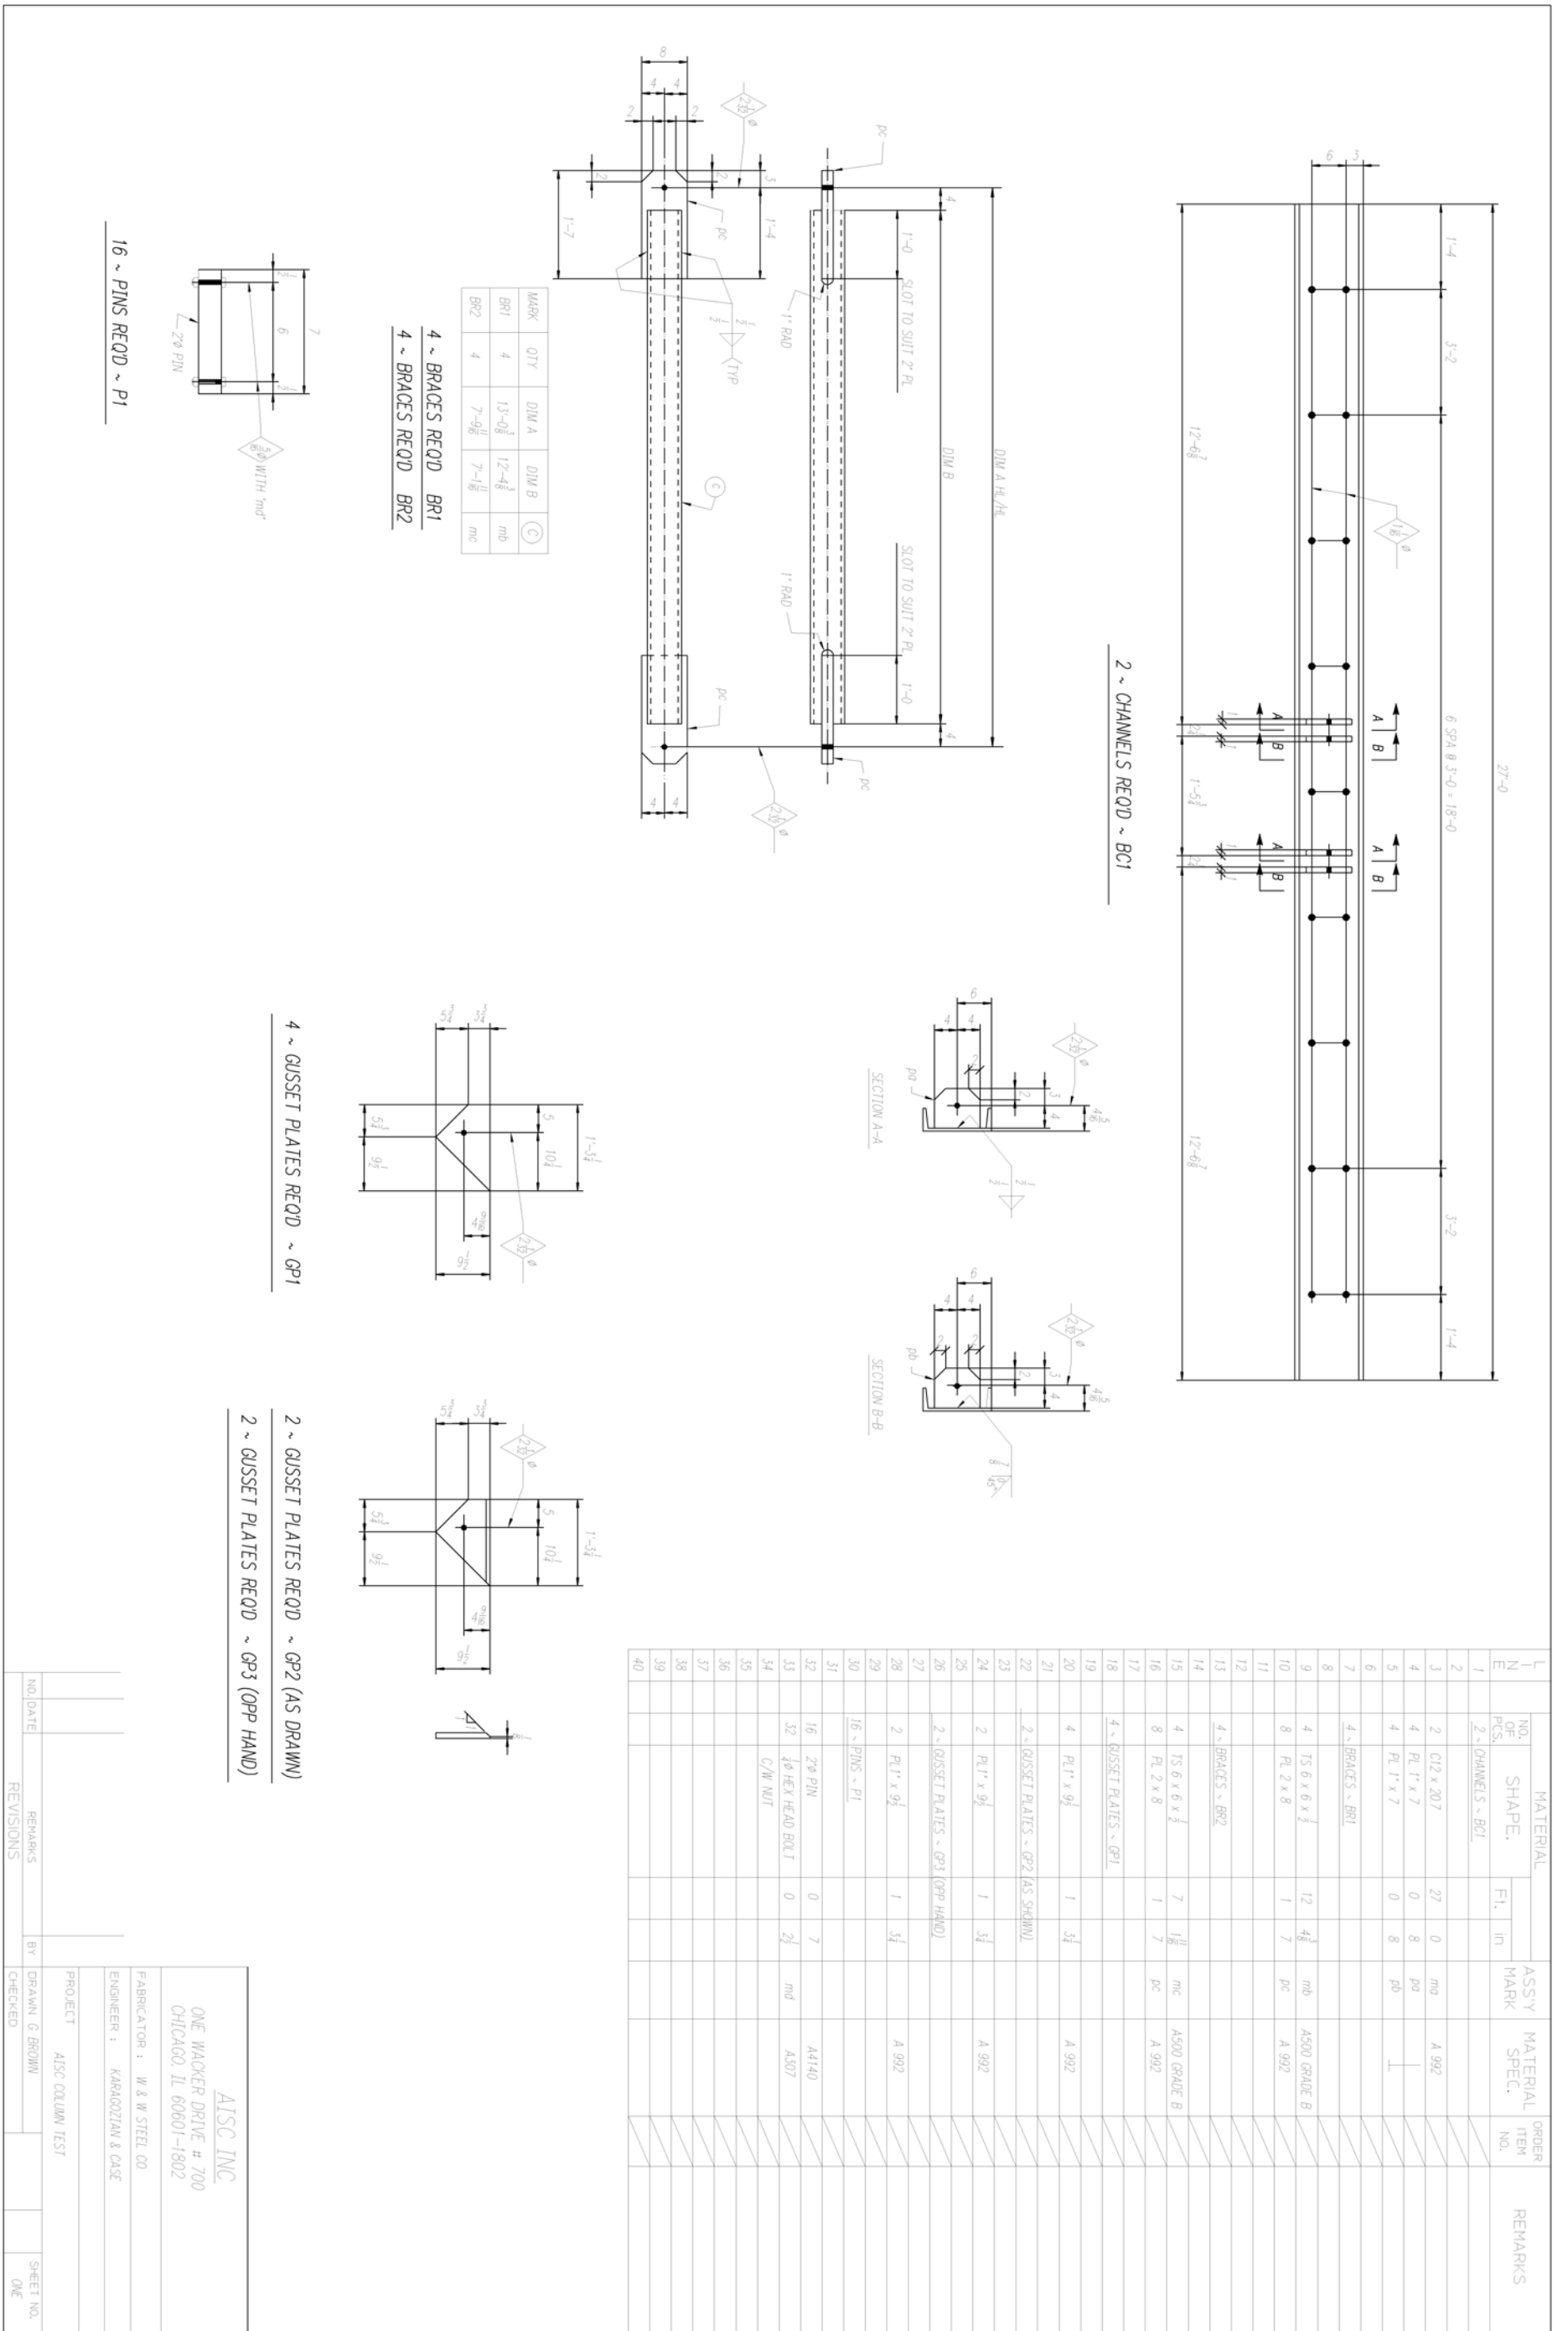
AISC shop drawings for AISC Column Test (1 of 2).
